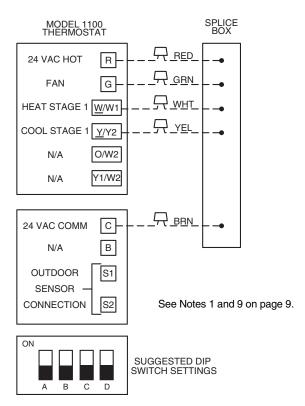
Single-Speed Packaged Air Conditioner with Single-Stage Gas Furnace — Model 1100 Thermostat
